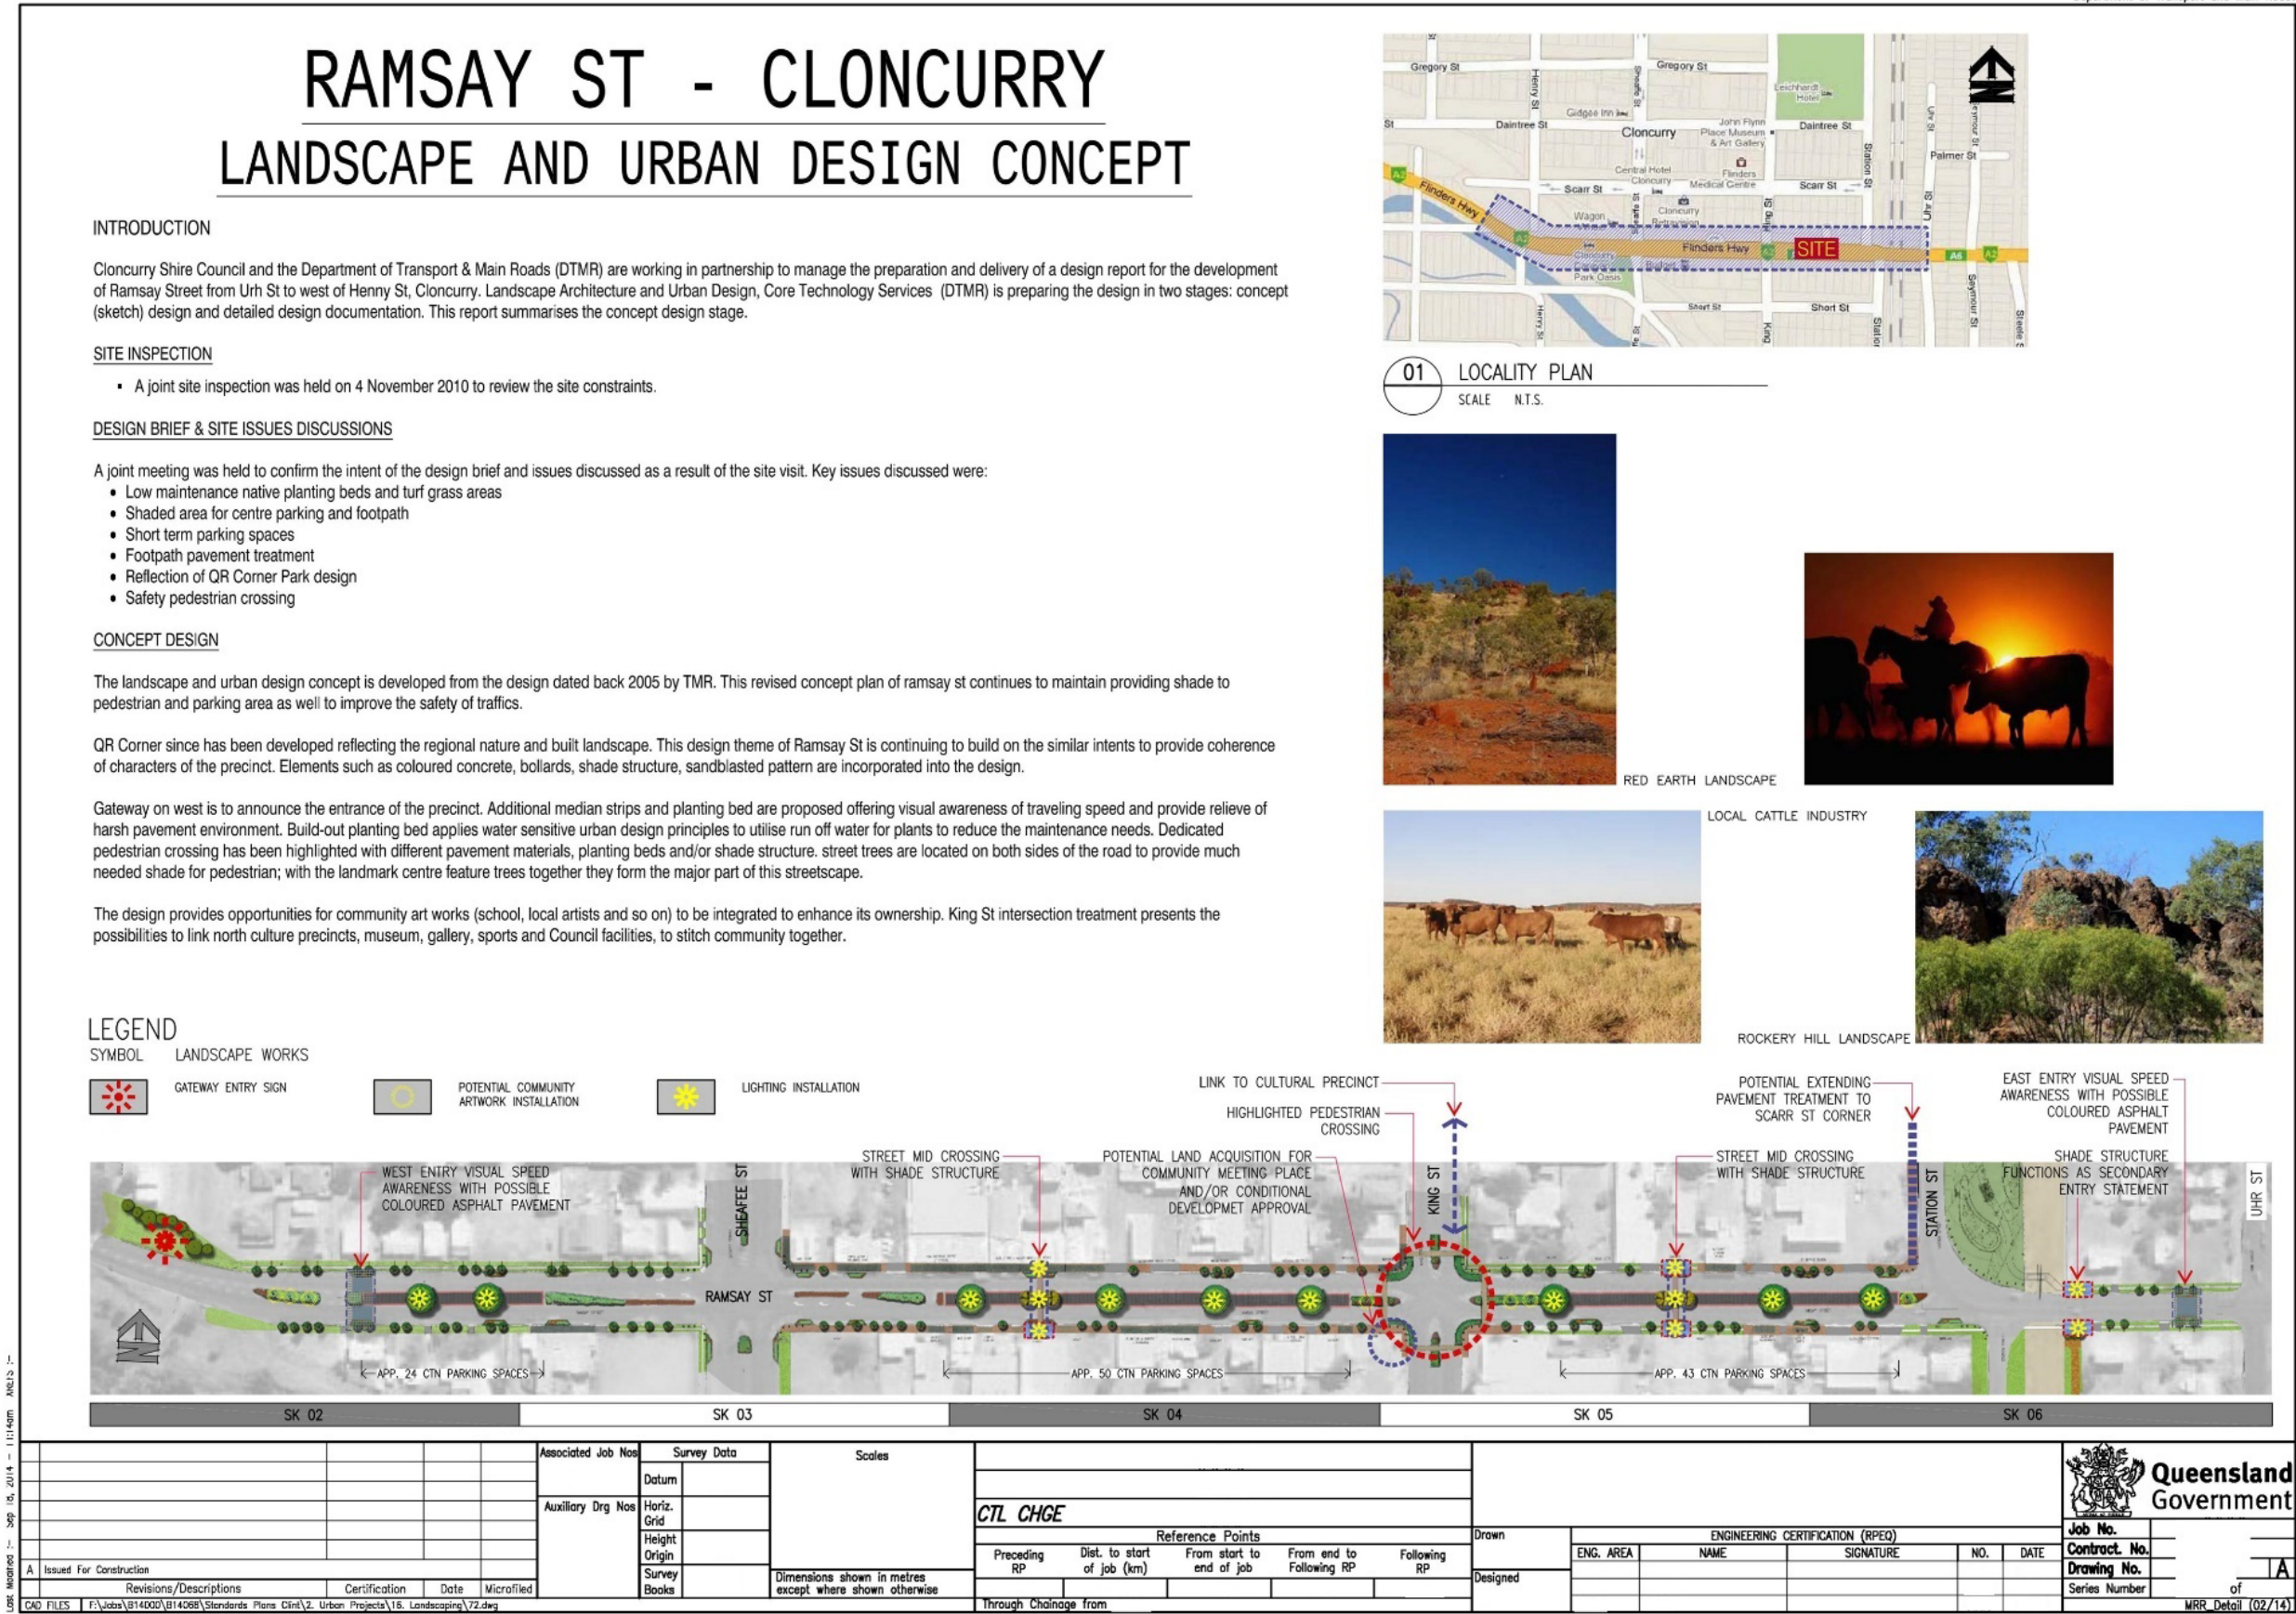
(b) – Landscaping layout and details – generic example 2
